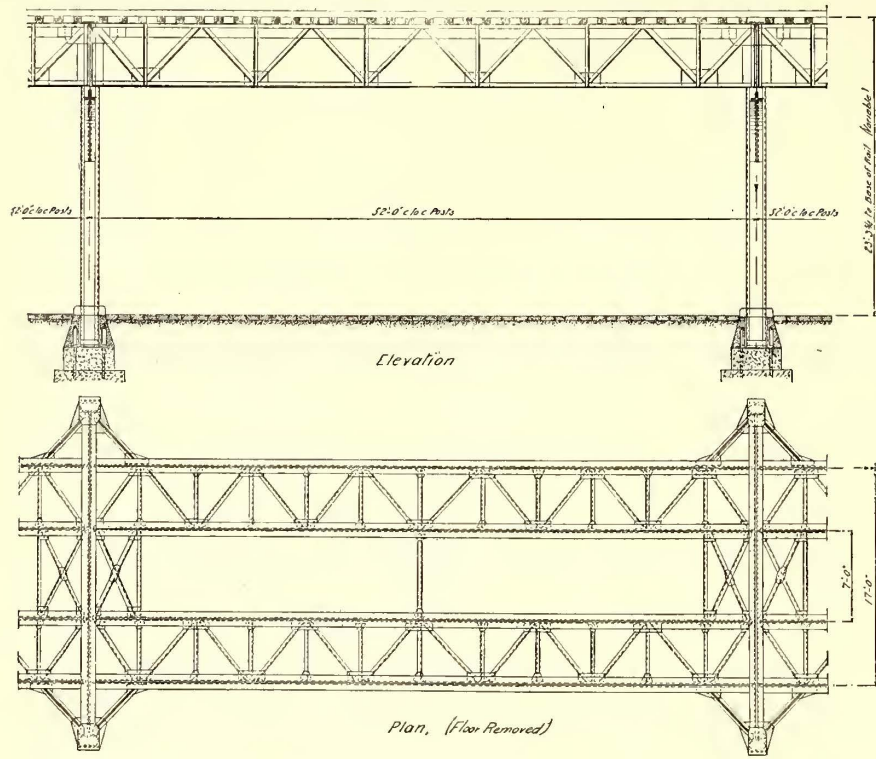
SIDE ELEVATION AND PLAN OF PRESENT TYPICAL LOOP SPAN
